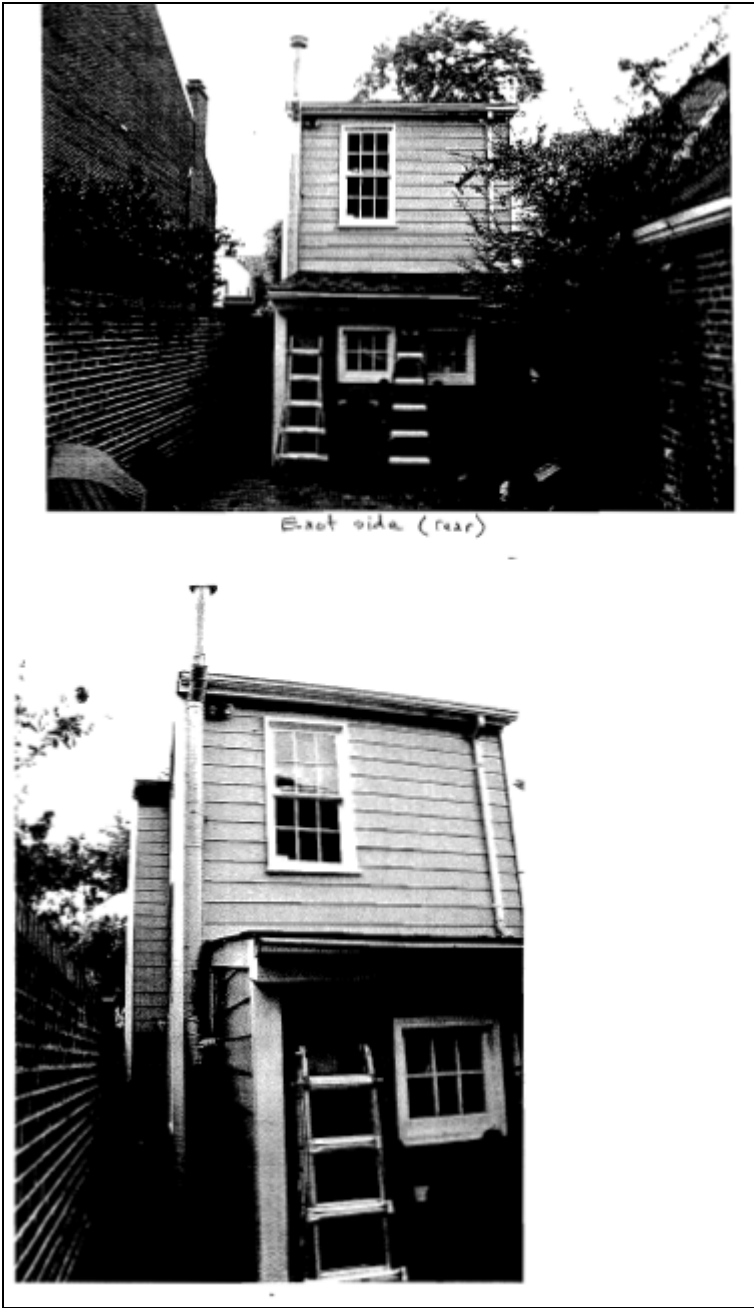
Rear (east) elevation - one-story addition proposed for demolition and rear elevation proposed for encapsulation.
